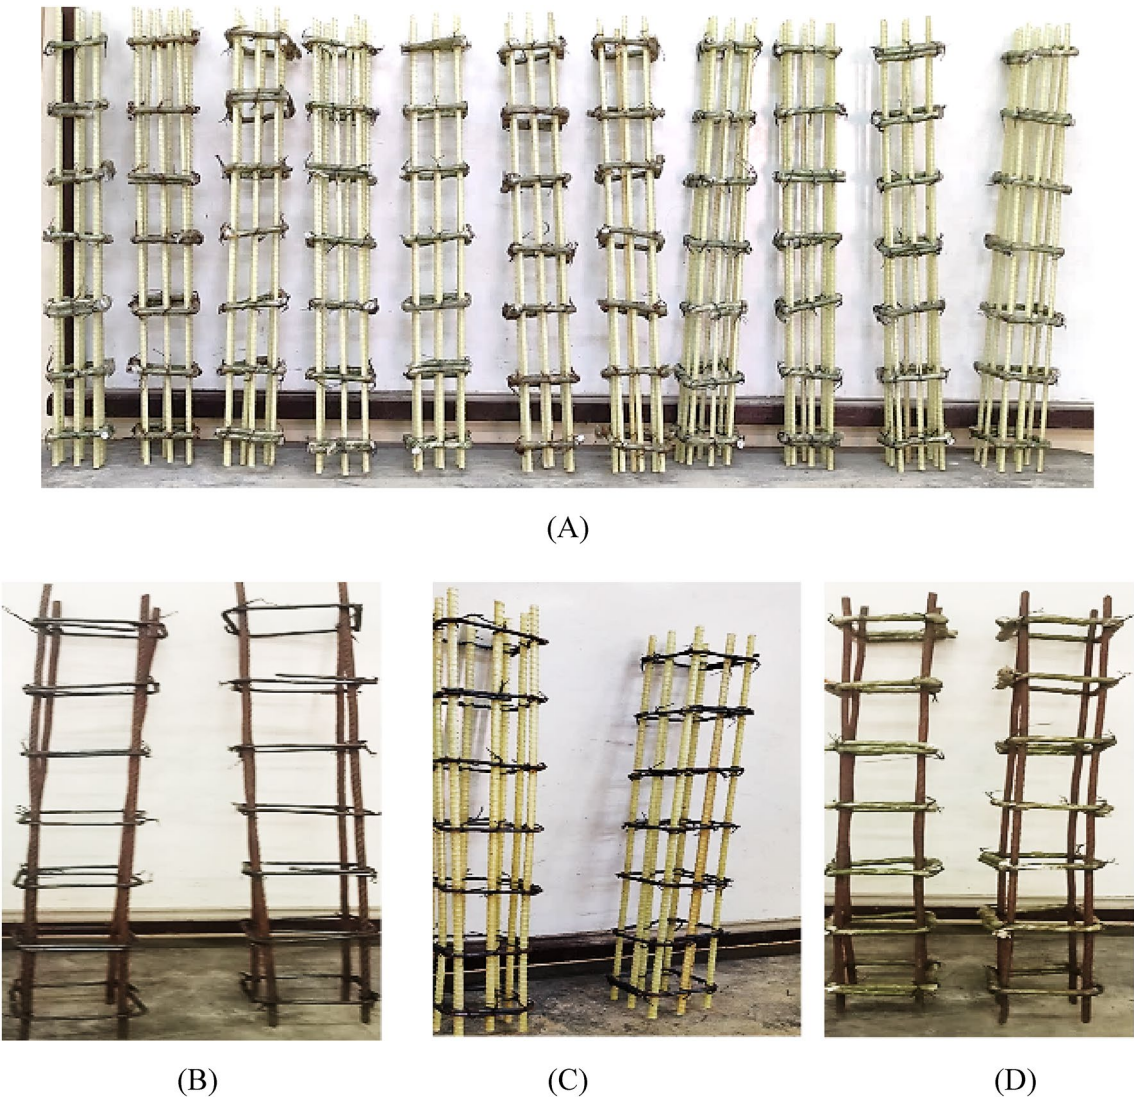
The reinforcement patterns: A full GFRP reinforcement, B full steel reinforcement, C GFRP longitudinal bars and steel stirrups, and D steel longitudinal bars and GFRP stirrups
